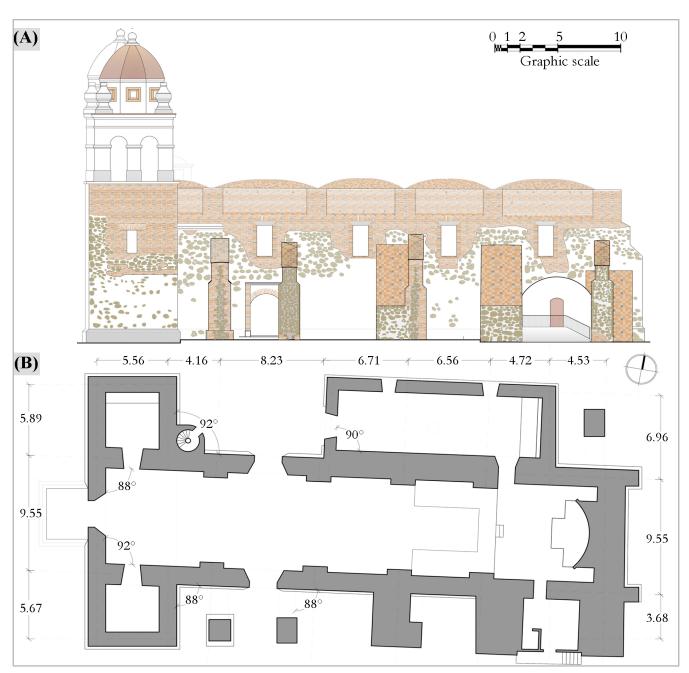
Architectural representation: (A) elevation view and (B) ground floor.
